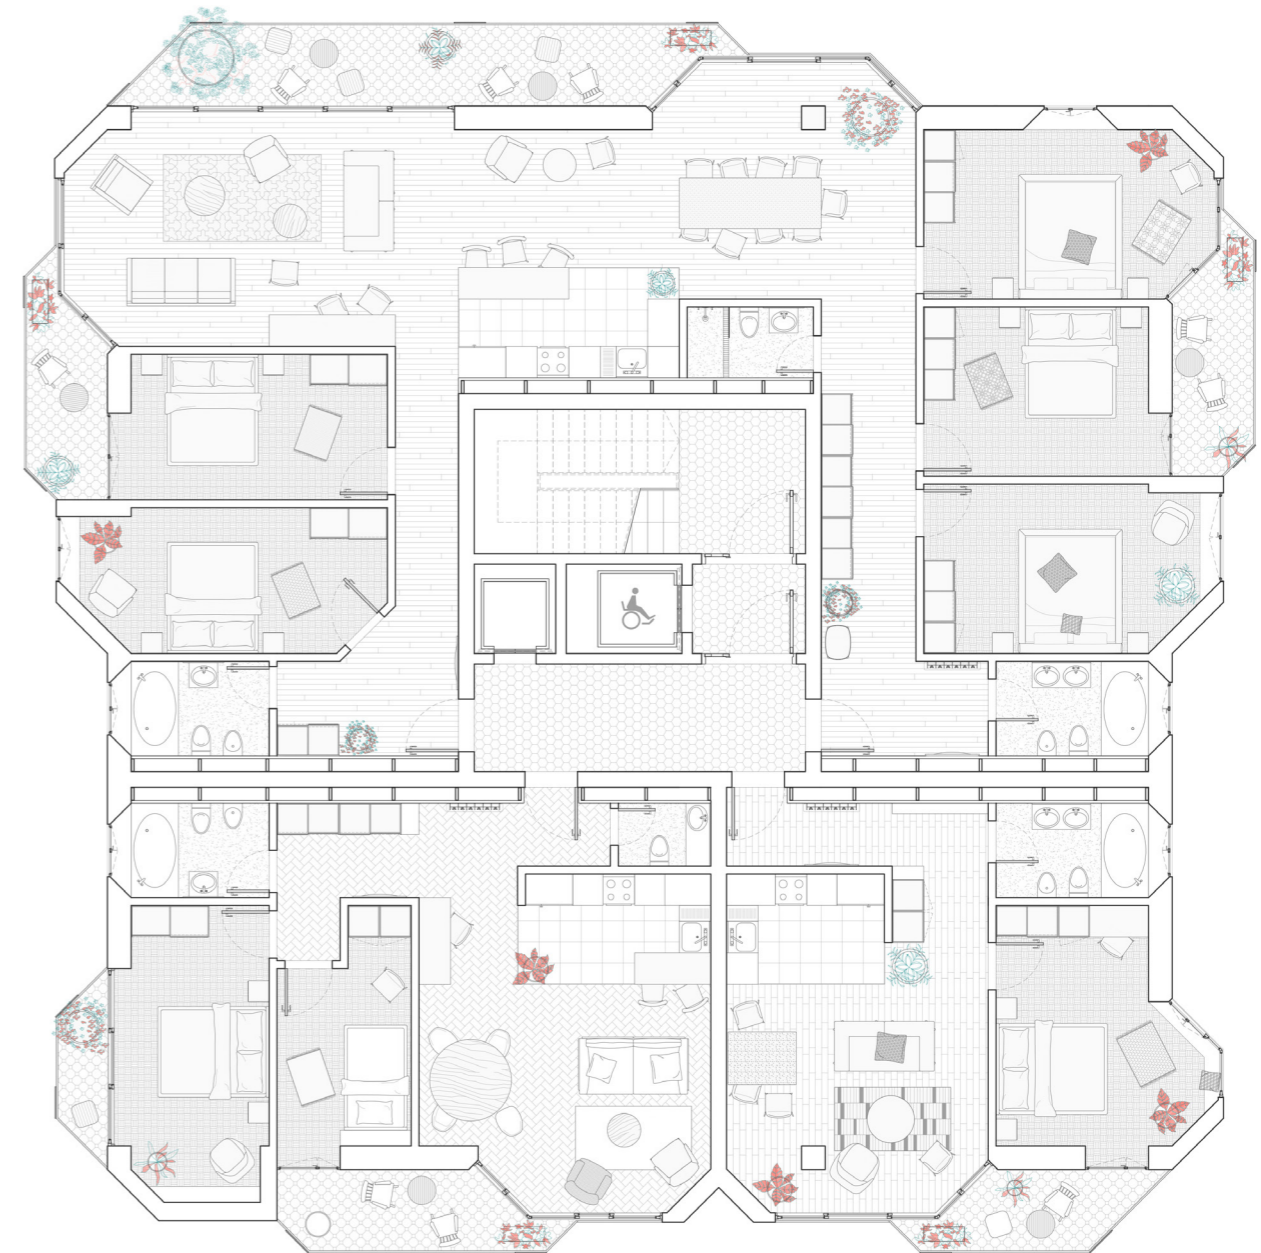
Type 1 - Dwelling Units Floor Plan (levels 2-5)
